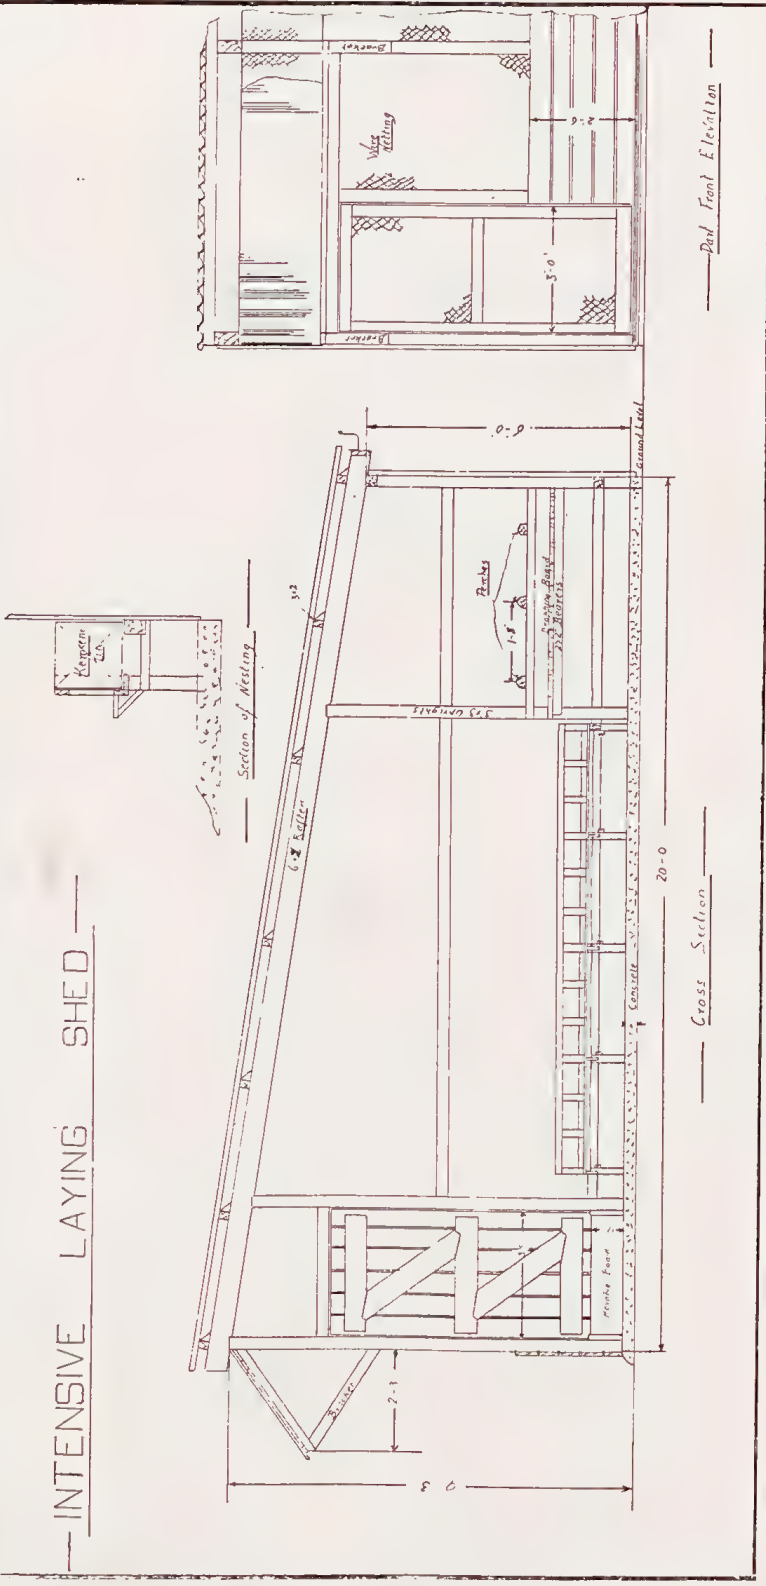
SHOWING END SECTION AND PART FRONT ELEVATION OF INTENSIVE LAYING SHED.
